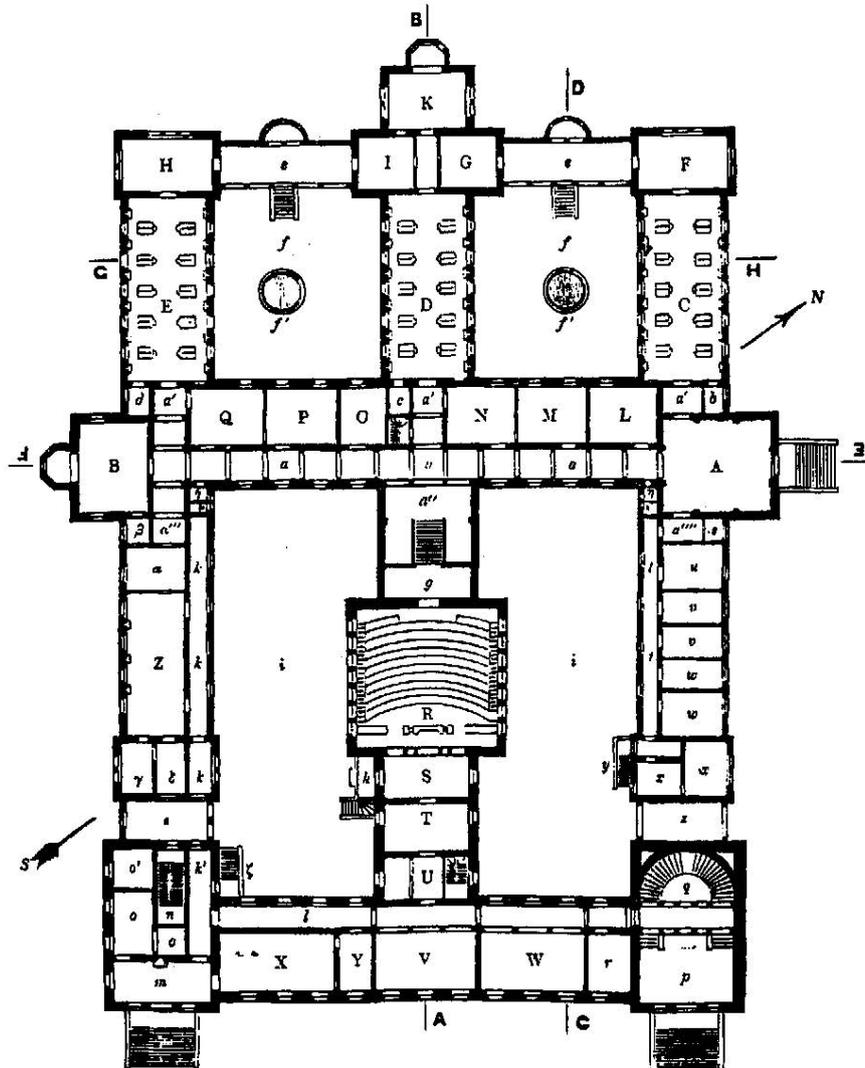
Ground plan of the building showing its rectangular structure with four inside arcades (Lichthöfe)^[3c]
